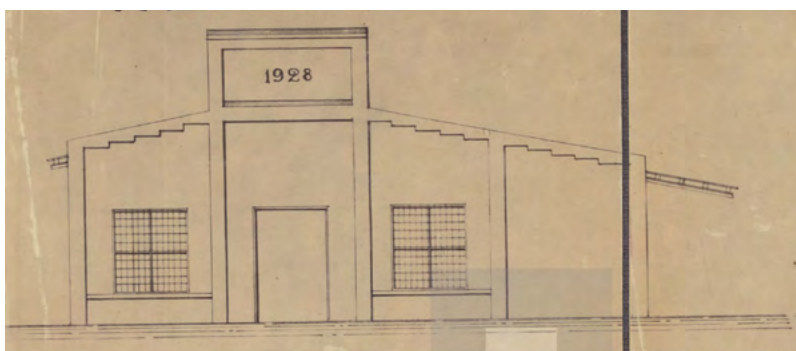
Design of the carpenter's workshop building – front façade – 1910, National Archives in Lublin, Lublin Governorate Government, Construction I, sign. 1910:4, p. 294
